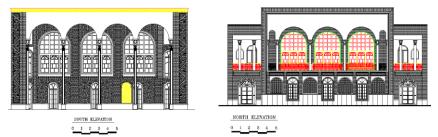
South and north elevation of Gadaki house (Tabriz C. H., 2007)
